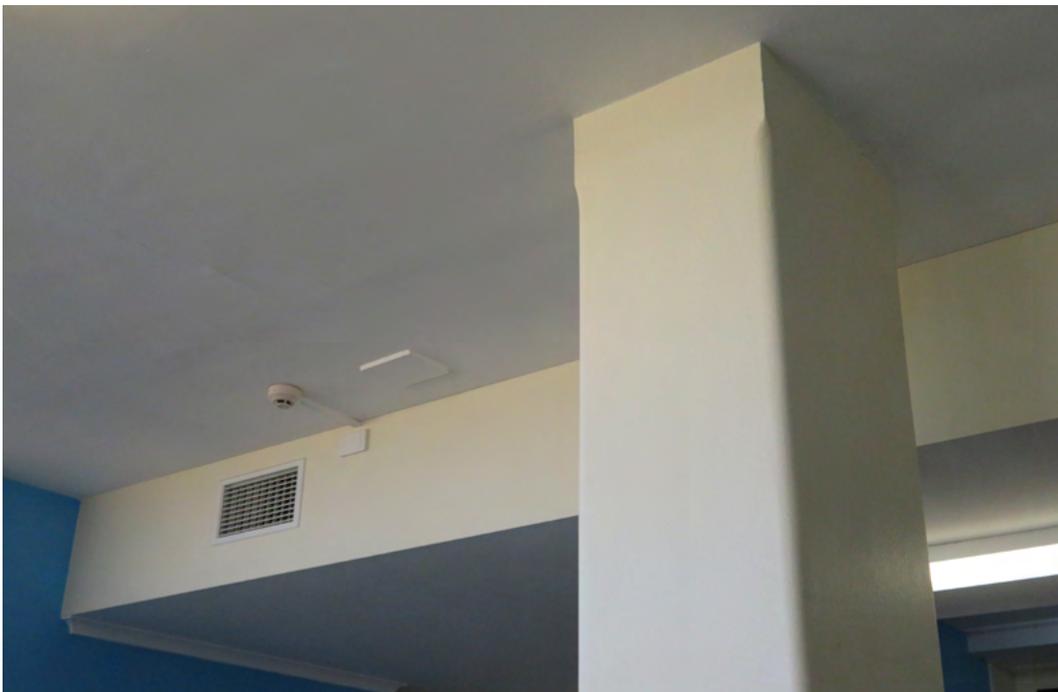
Original concrete-encased steel columns with modern air conditioning plenum to its rear, 2017
